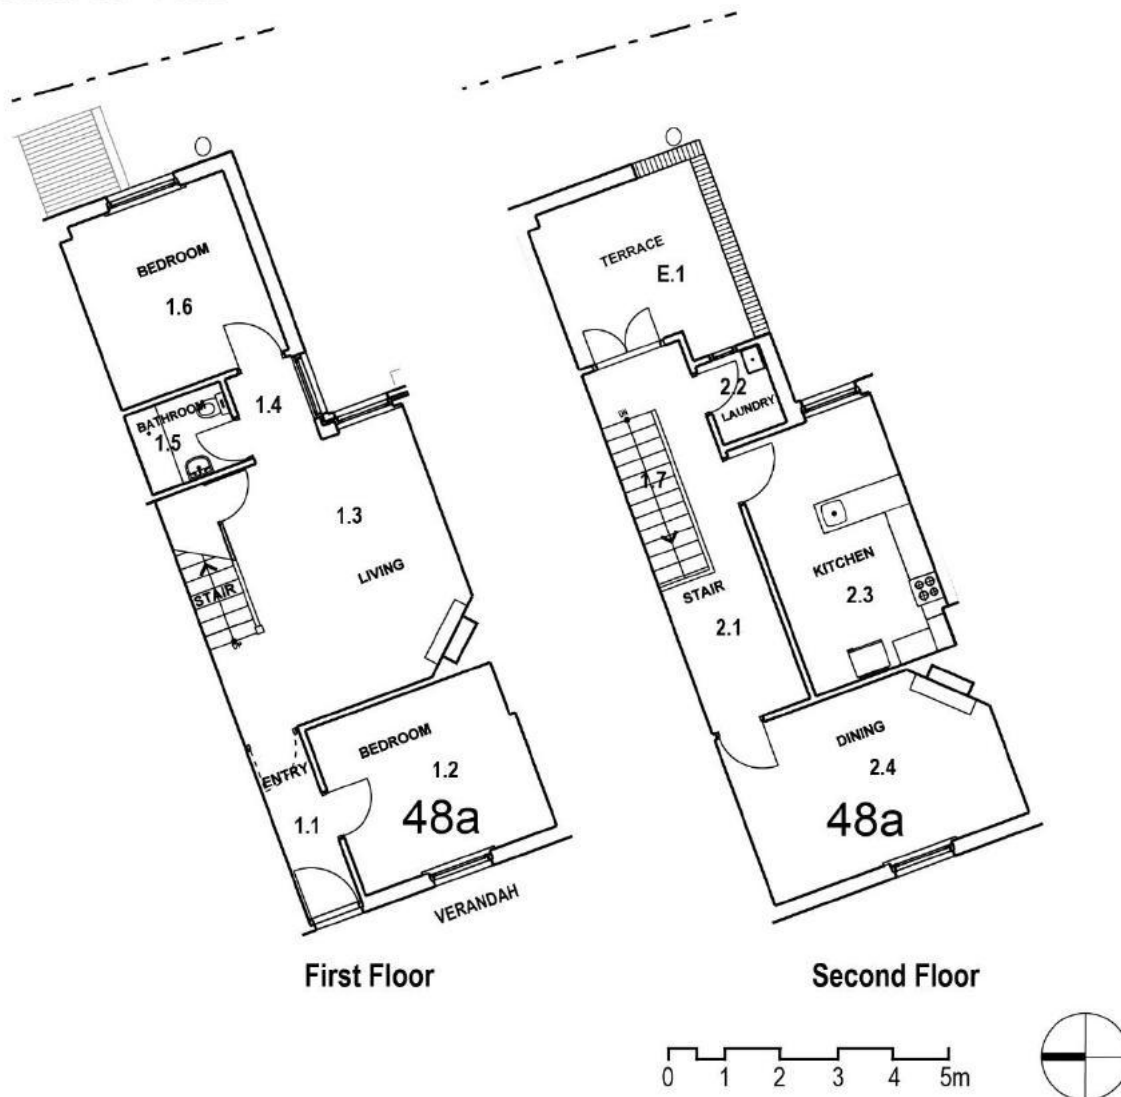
Floor plans of Flat 48A / 46–56 Gloucester Street showing layout of flat and space numbers, for the first and second floors. (Source: LAHC, with GML overlay 2016)
